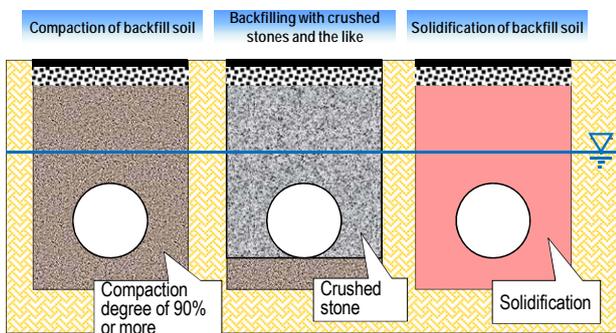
Three Backfilling Measures for Sewer Pipe Conduits
